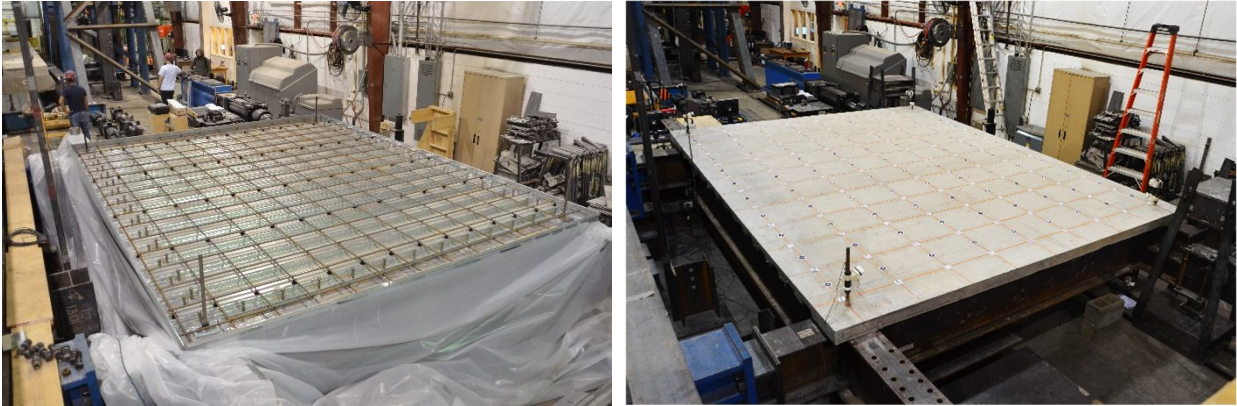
Specimen 2/4.5-4-N-RS-DT Before and After Concrete Placement
